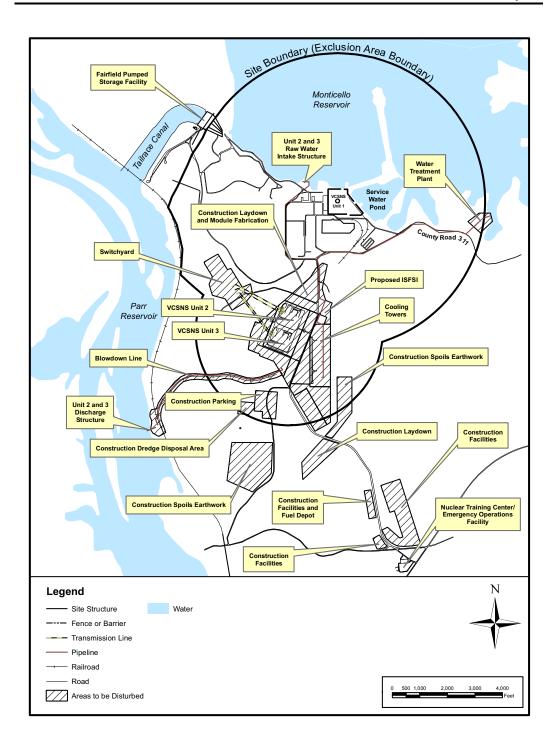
VCSNS Site and Proposed Plant Footprint
